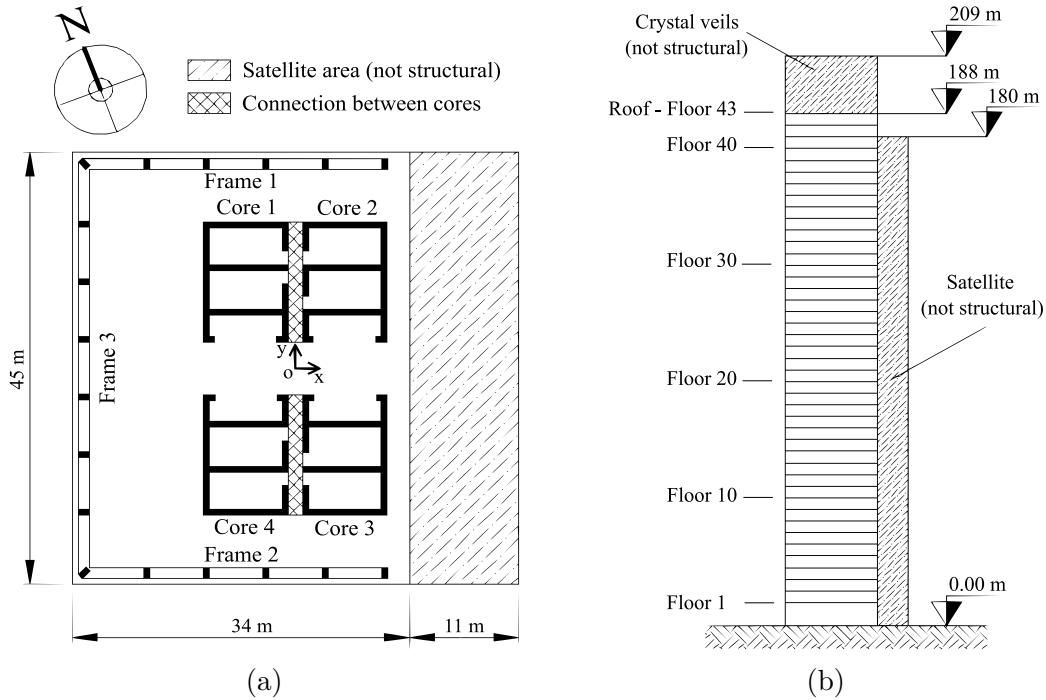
(a) Typical floor plan; (b) East-West elevation [188]
